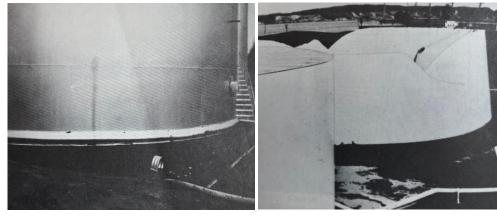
Elephant Foot Buckling (left) and Roof Collapse (right) following 1964 Great Alaskan Earthquake (Hanson 1973)
